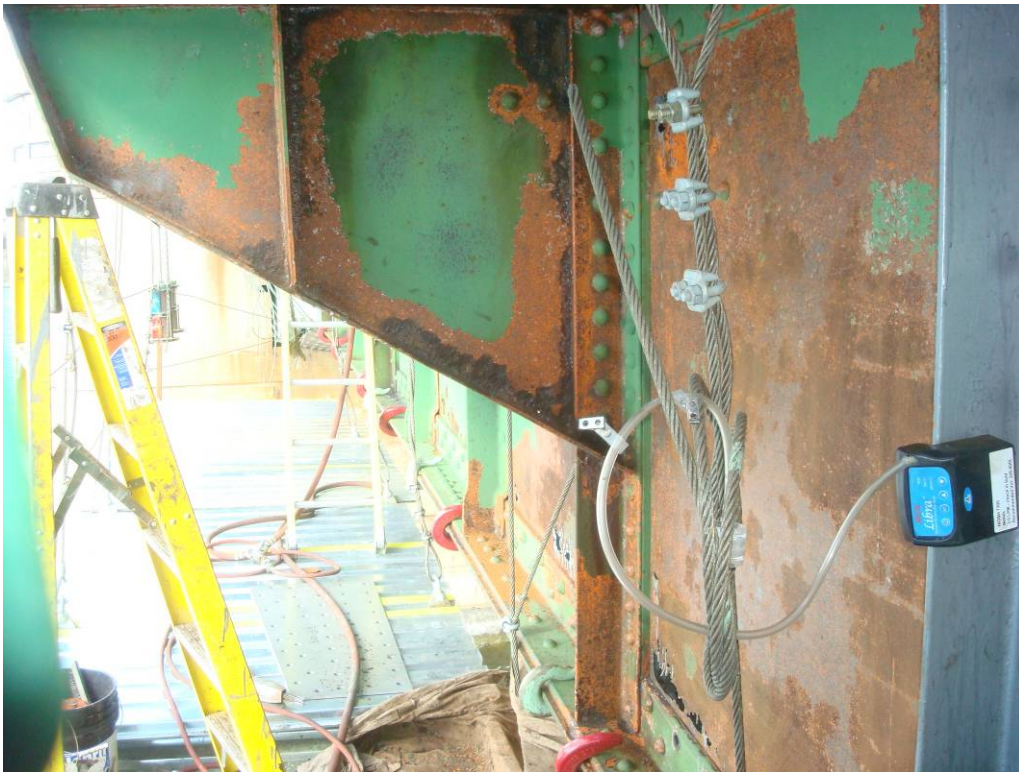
The Southwest girder and cantilevered bracket at FB3, looking North, cleaned with hand and power tools.
